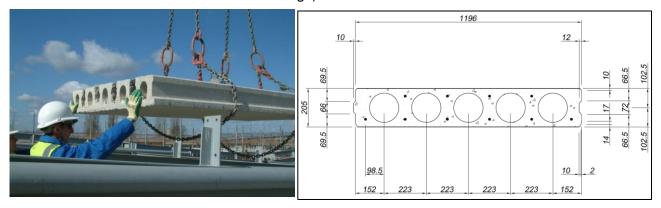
Example of Hollowcore plank (left) and typical section through Hollowcore (right)
